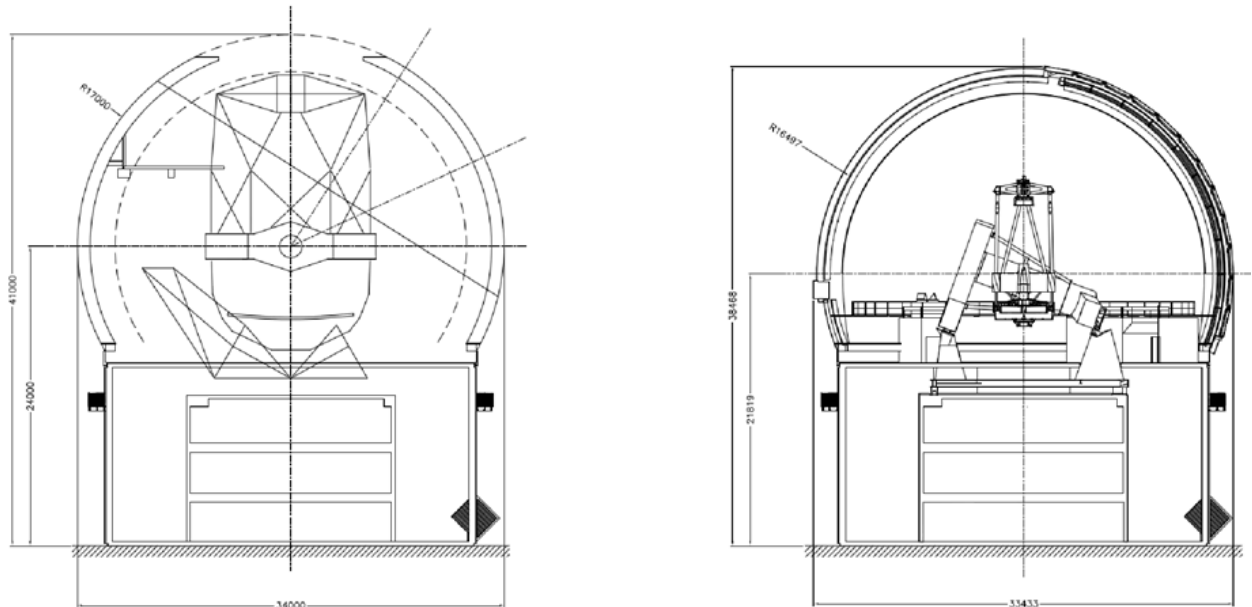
Cross section views and exterior dimensions of the proposed ngCFHT facility (left) and current CFHT facility (right).
